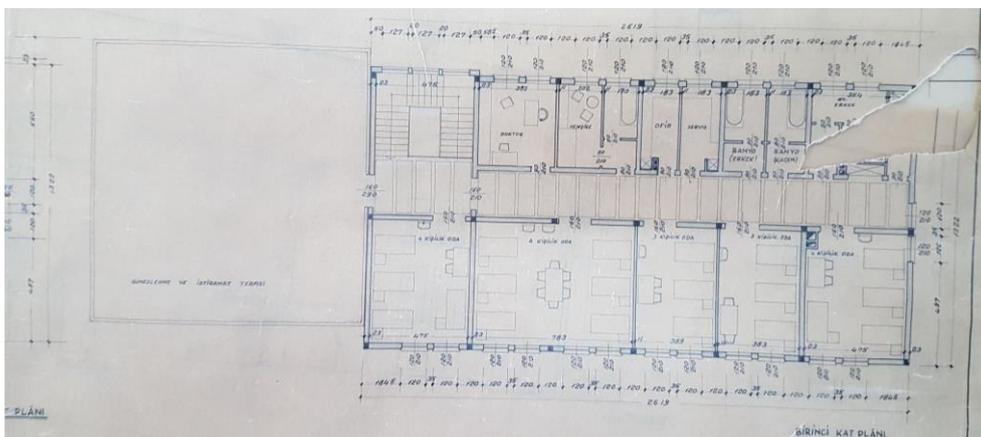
The first floor plan of the hospital (Source: TTK Archive, 2020)
